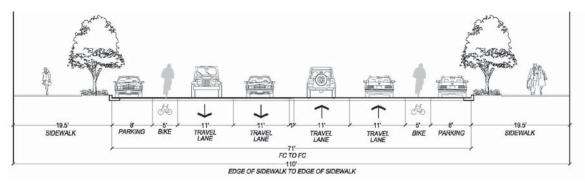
Recommended mid-block cross-section for S. Eads Street north of 23rd Street S.
